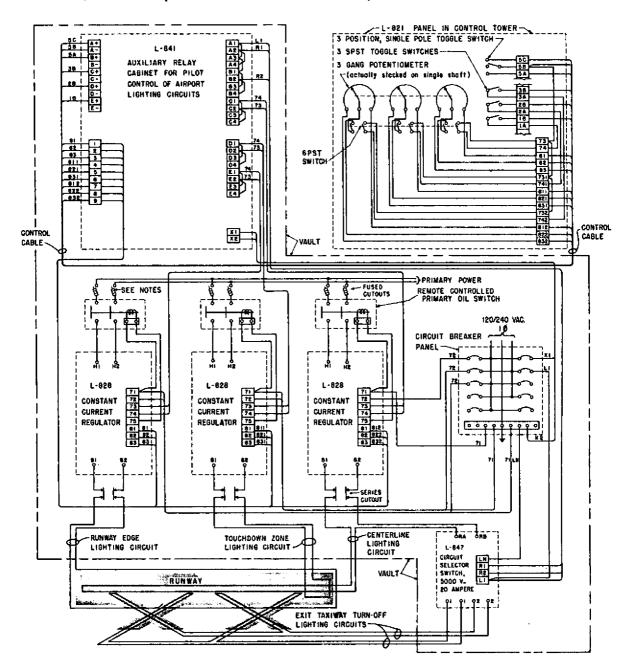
TYPICAL IN-RUNWAY LIGHTING SYSTEM WIRING DIAGRAM WITH DC CONTROL
